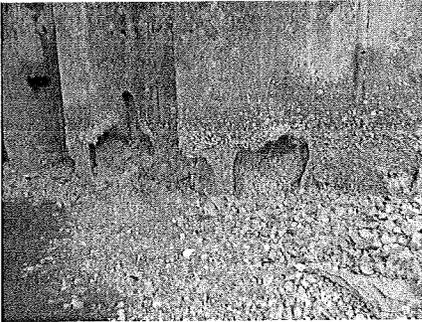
West abutment, east face, holes in bulkhead at mudline, looking west.
